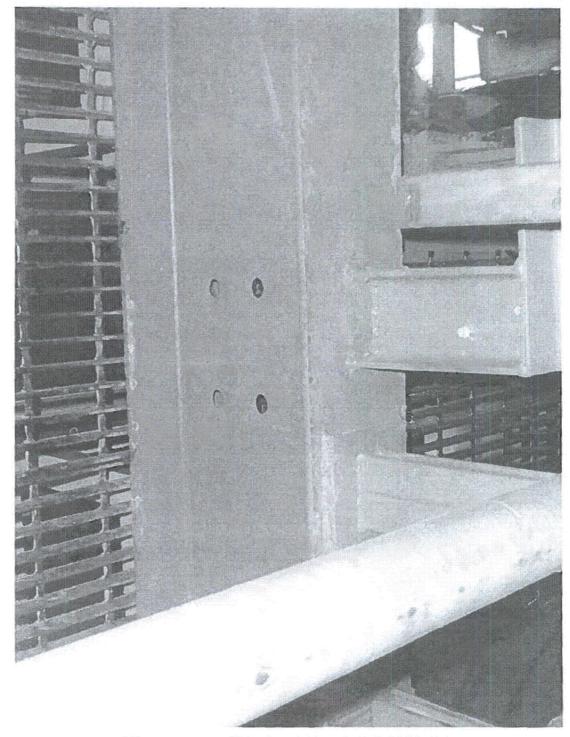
Empty Holes in Building Steel (2E11-C002A)
